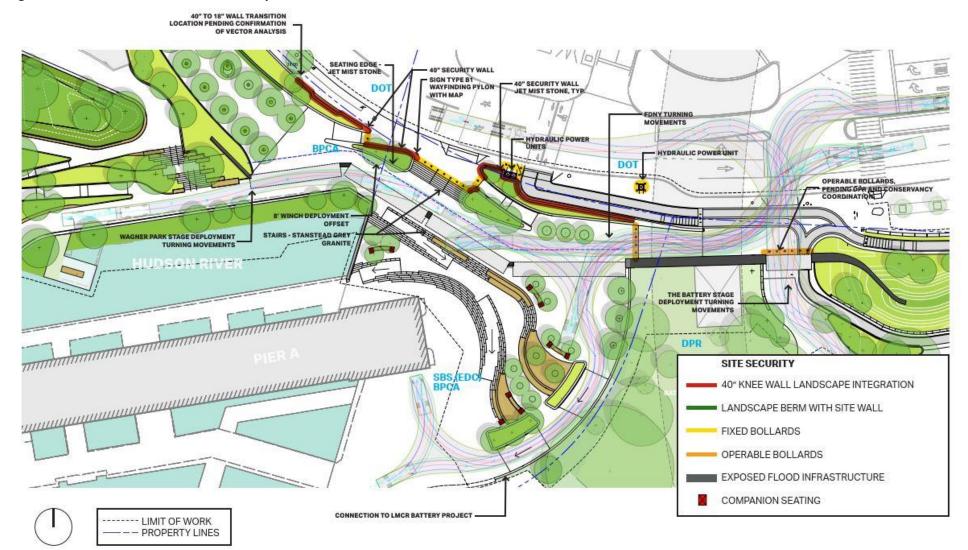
Pier A Plaza Proposed Conceptual Design
